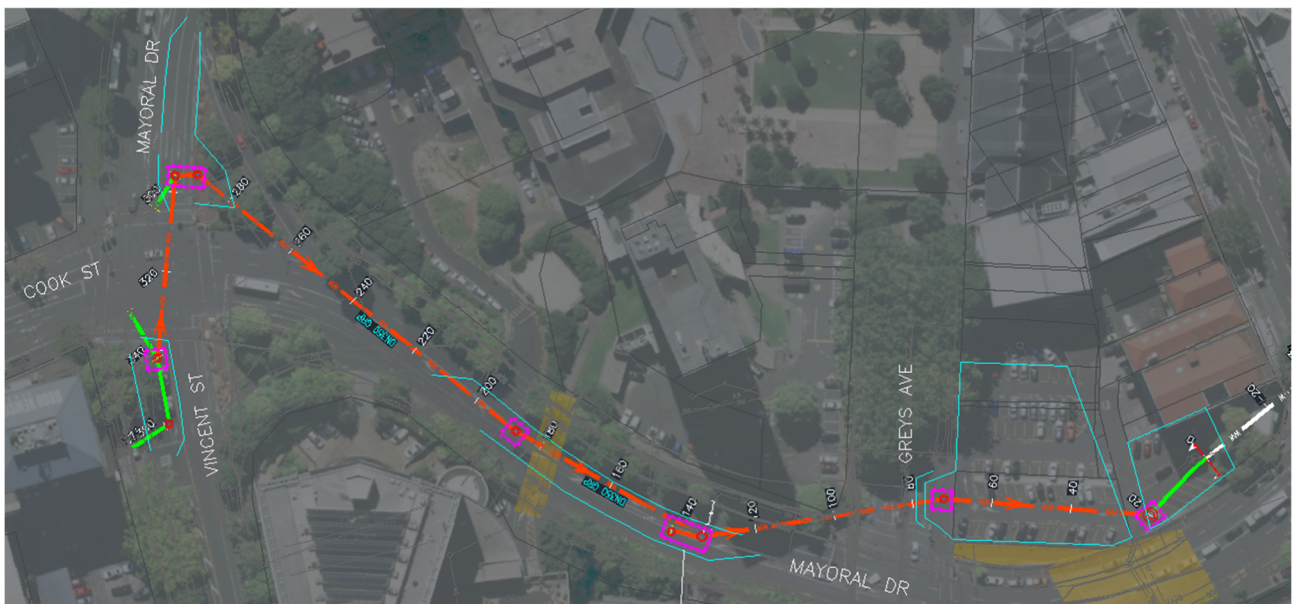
Main Construction Works Overview (orange lines are trenchless pipelines, green are trenched pipelines)
